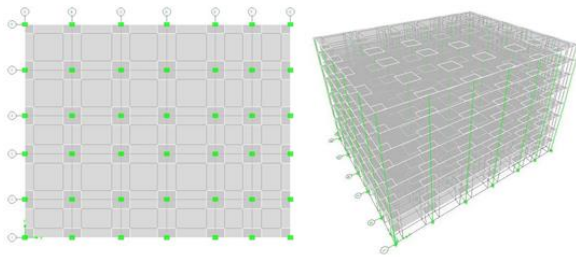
Plan and 3D view of Flat Slab Building Without Drops
